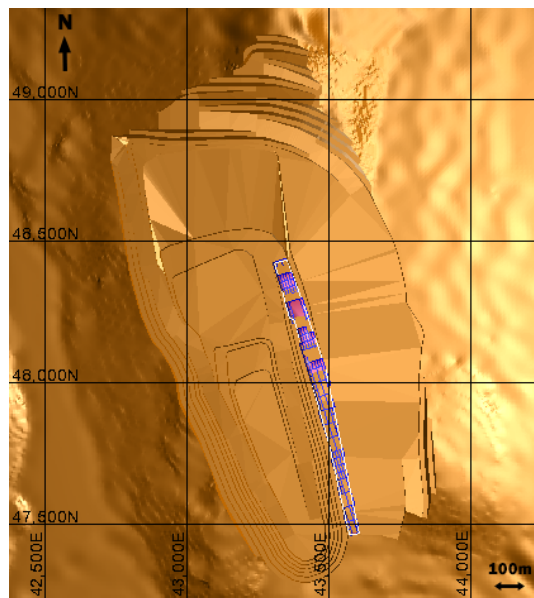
Plan view of the constrained haul road blocks for haul segment 5 (rock code 502), from the pit floor to the waste dump, before relocation of the trolley line.
